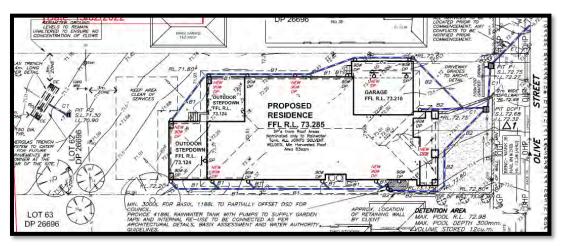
Proposed stormwater management plan detailing dispersal to Olive Street with rear absorption trench.
